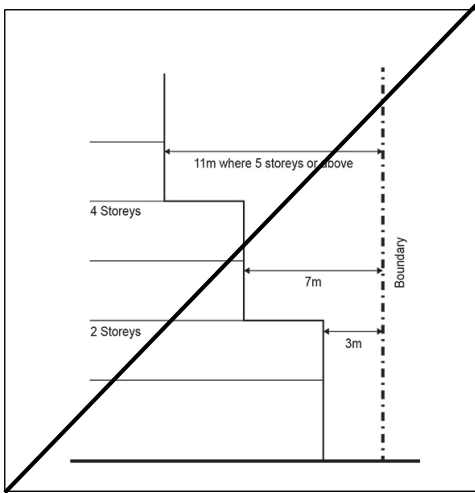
Building setbacks adjoining Single House zone sites and sites within the public open space zones less than 2000m²
